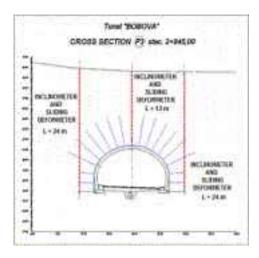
Measuring profile of the Bobova Tunnel with designated positions of the installed inclinometers and deformeters
